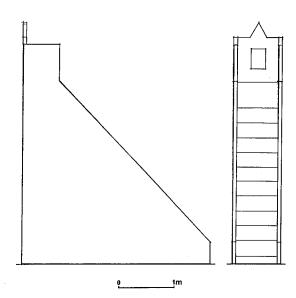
Kūhpāya, Masǧid-i Ğāmi^c: plan and elevation of minbar.
